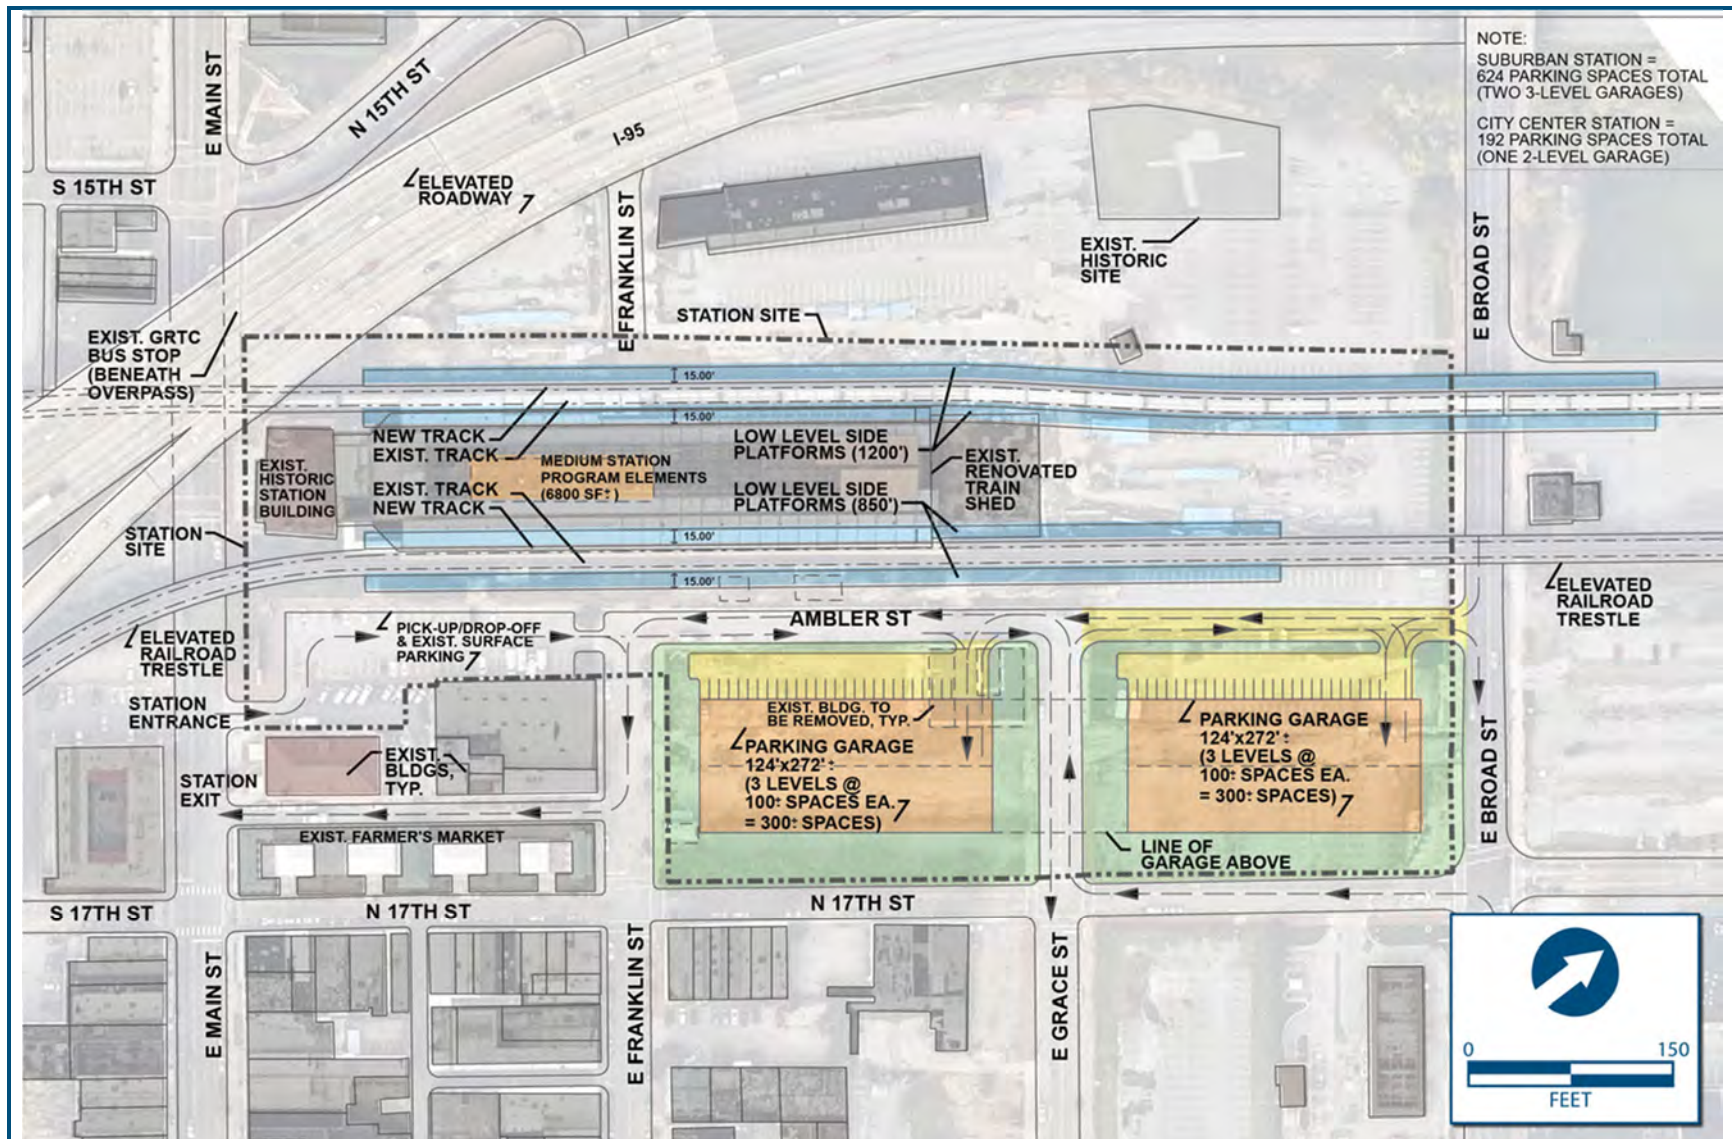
Main Street Station Improvements for Build Alternative 6D
